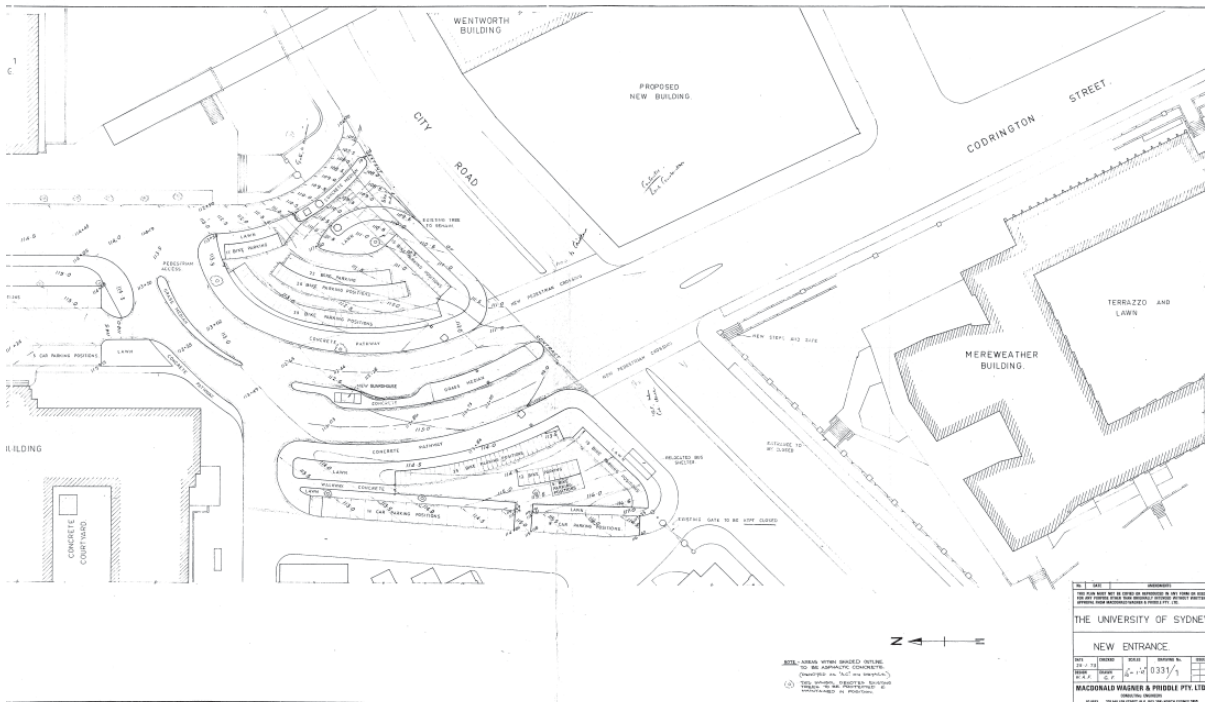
Plan (1973) of the new loop road and City Road vehicular entrance, positioned to align with Codrington Street (now known as Butlin Avenue).
